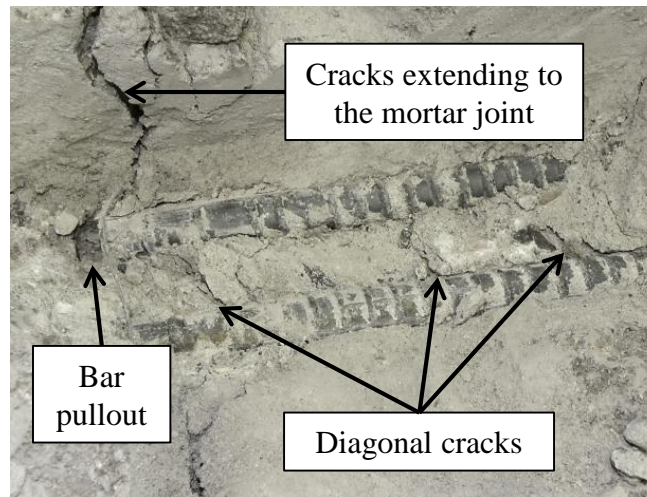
Internal damage and crack propagation observed in specimens with 25 mm splice-bar spacing.
